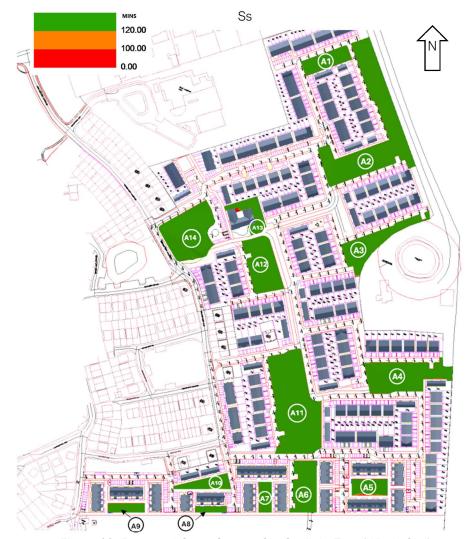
Proposed Open Spaces 2hr Sunlight Test (Whole Site)
